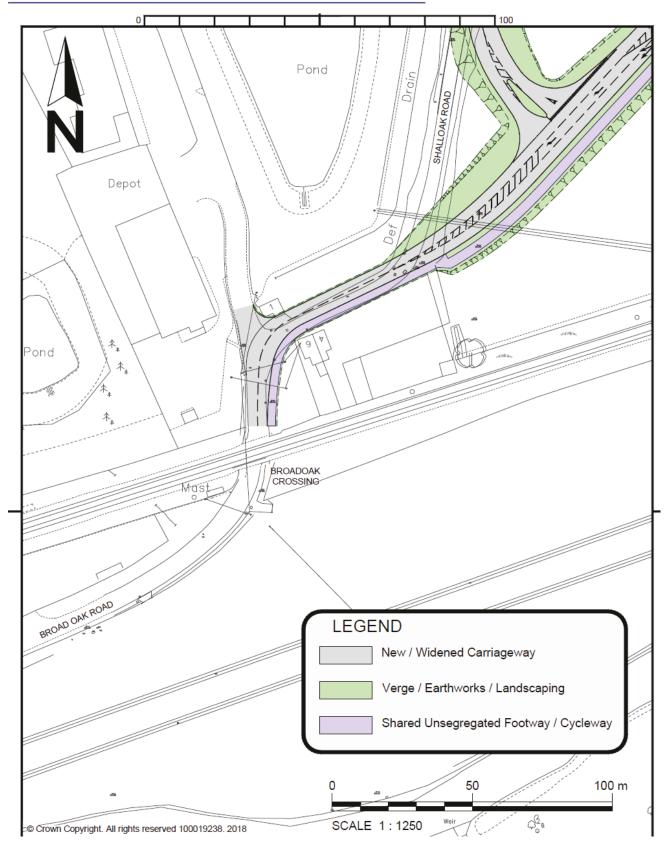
Proposed Widening of the Carriageway to the North of Broad Oak Level Crossing
